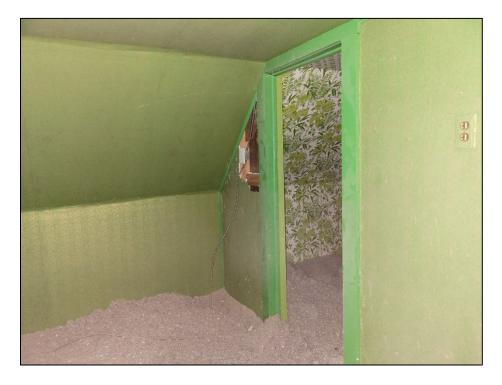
First floor drywall ceiling and walls containing ACM drywall beneath wallpaper. The loose insulation on the first-floor floor is non-detect.
